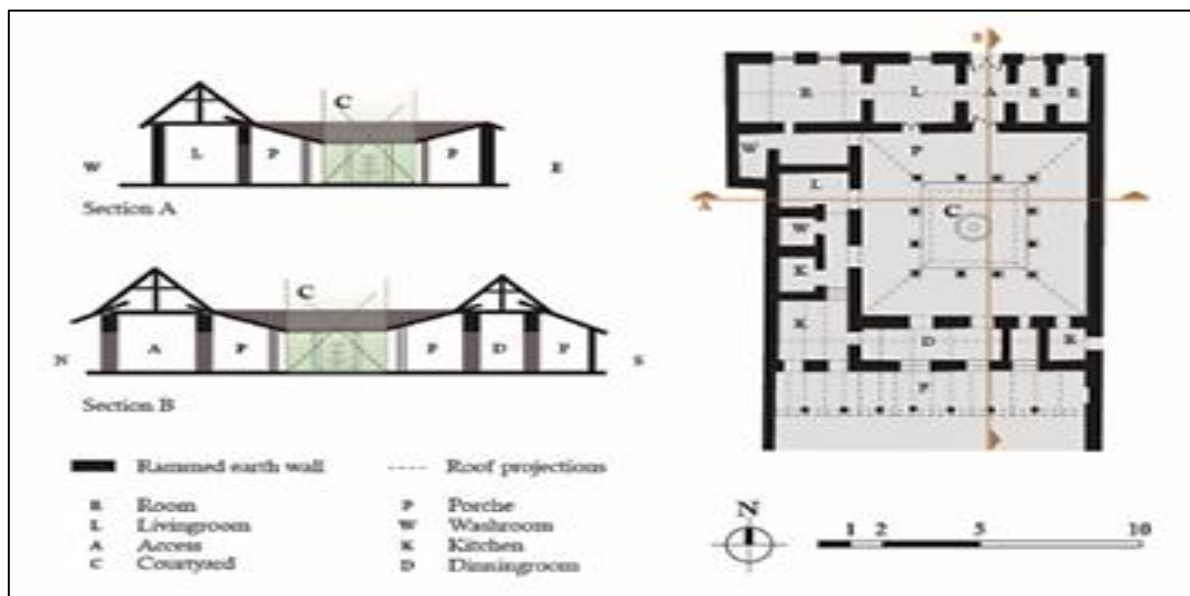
Plan and Section of Vernacular Building at Latitude 6.39°N (23)
